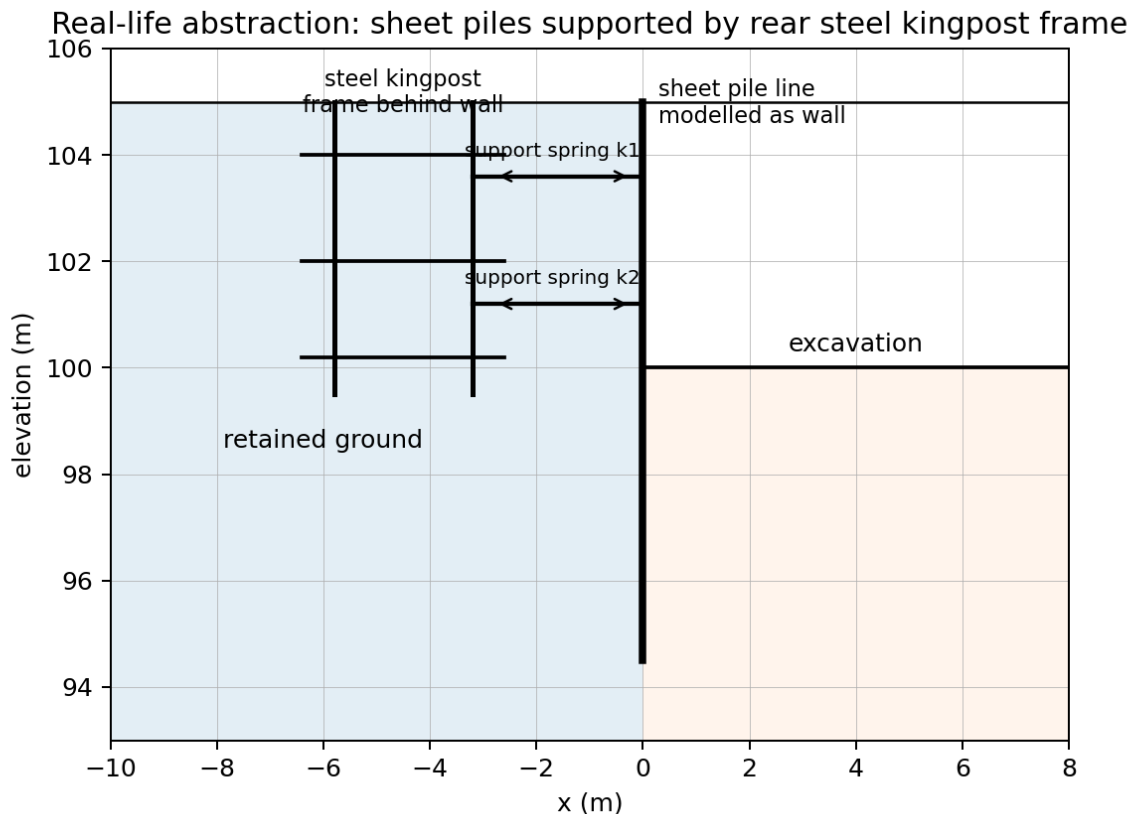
Sheet pile and rear kingpost frame represented as wall plus support springs.
